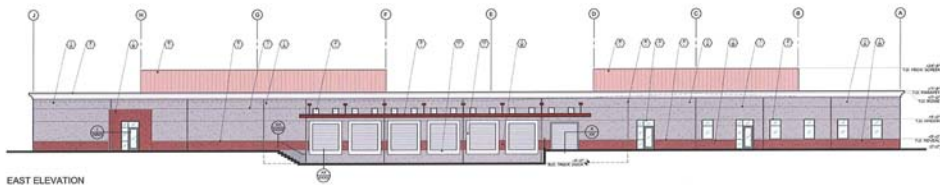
Southerly Portion USDA Building Color Elevations
